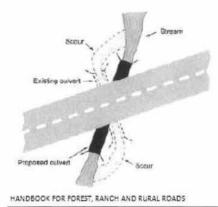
Culvert alignment should be in relation to the stream and not the road. It is important that the stream enters and leaves the culvert in a relatively straight horizontal alignment so streamflow does not have to turn to enter the linket or discharge into a bank as it exits. This figure shows a redesigned culvert installation that replaces the bending alignment that previously existed. Channel turns at the linket increase plugging potential because wood going through the turn will not align with the latest. Similarly, channel turns at the linket are often accompanied by scour against the channel banks (Wisconsin Transportation Information Center, 2004).
